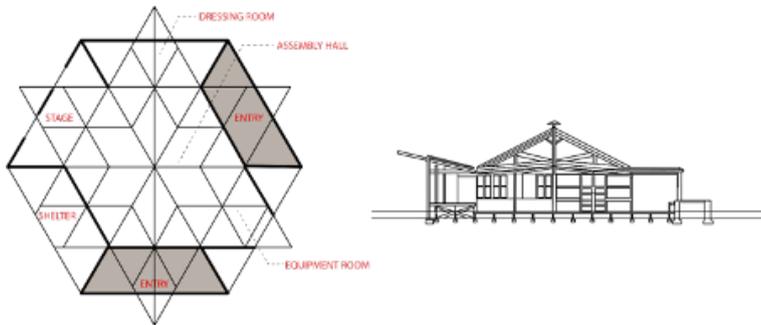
Plan and section of Kevin Borland's, School Hall at Preshil, 1962
